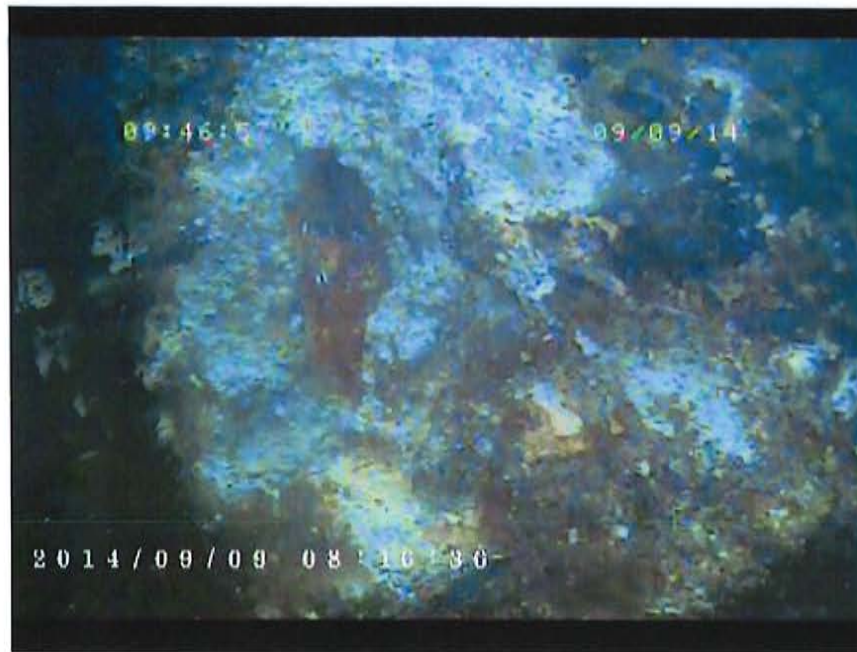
Typical Concrete Condition with 1/8" to 1/4" Soft Concrete (Station 1 + 15 Shown)
